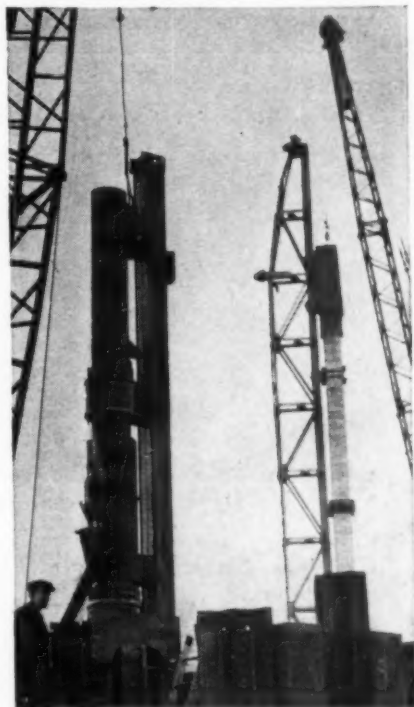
Driving Steel and Prestressed Concrete Piles.
